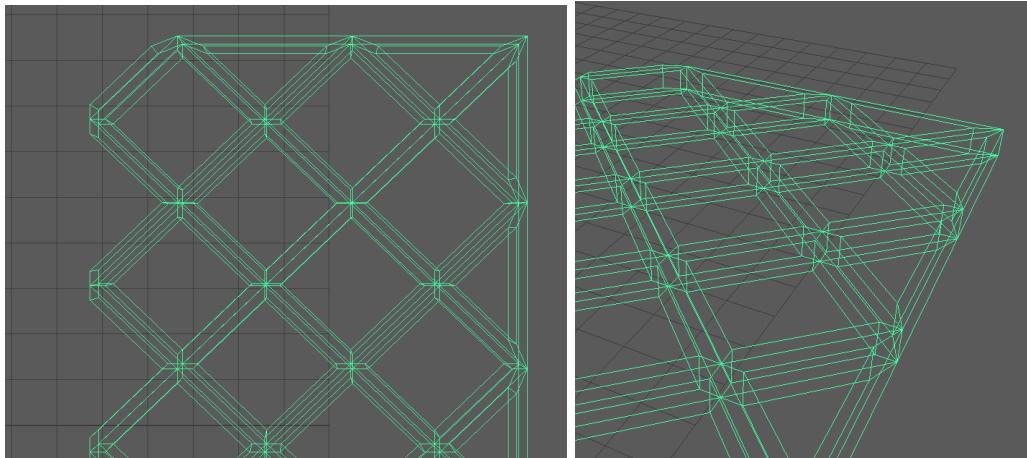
Lattice ceiling underneath the roof of the courtyard.
